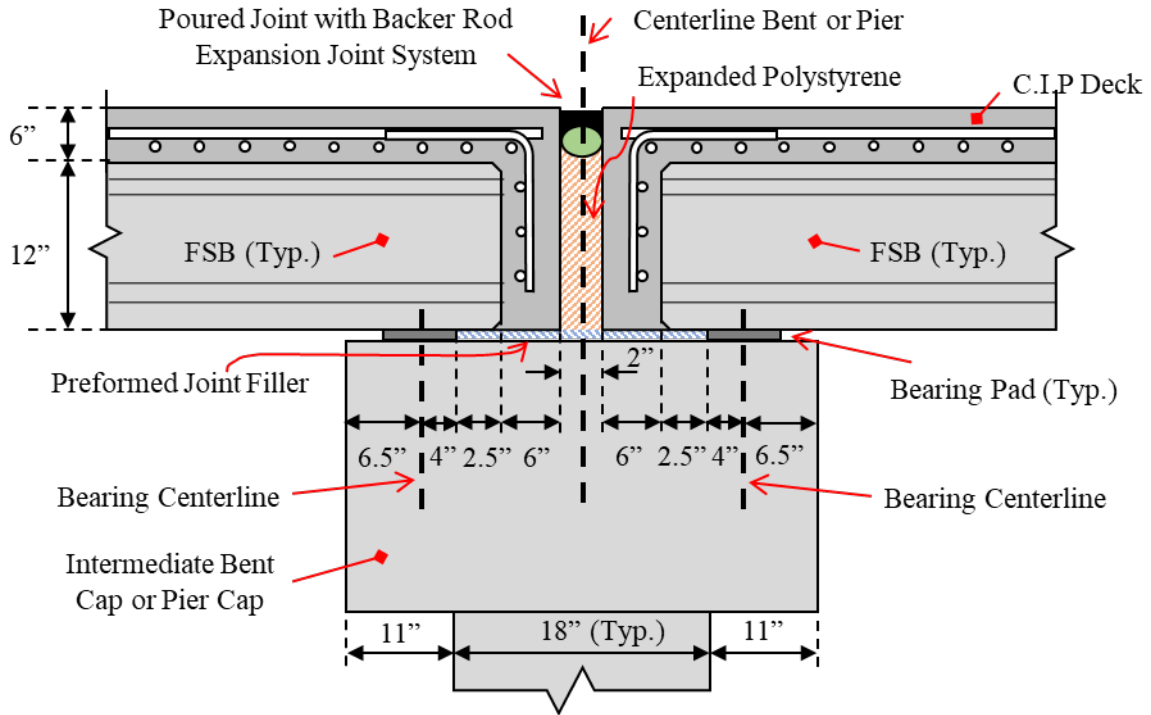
Typical FSB detail at intermediate bents or piers (Adapted from FDOT [19])
